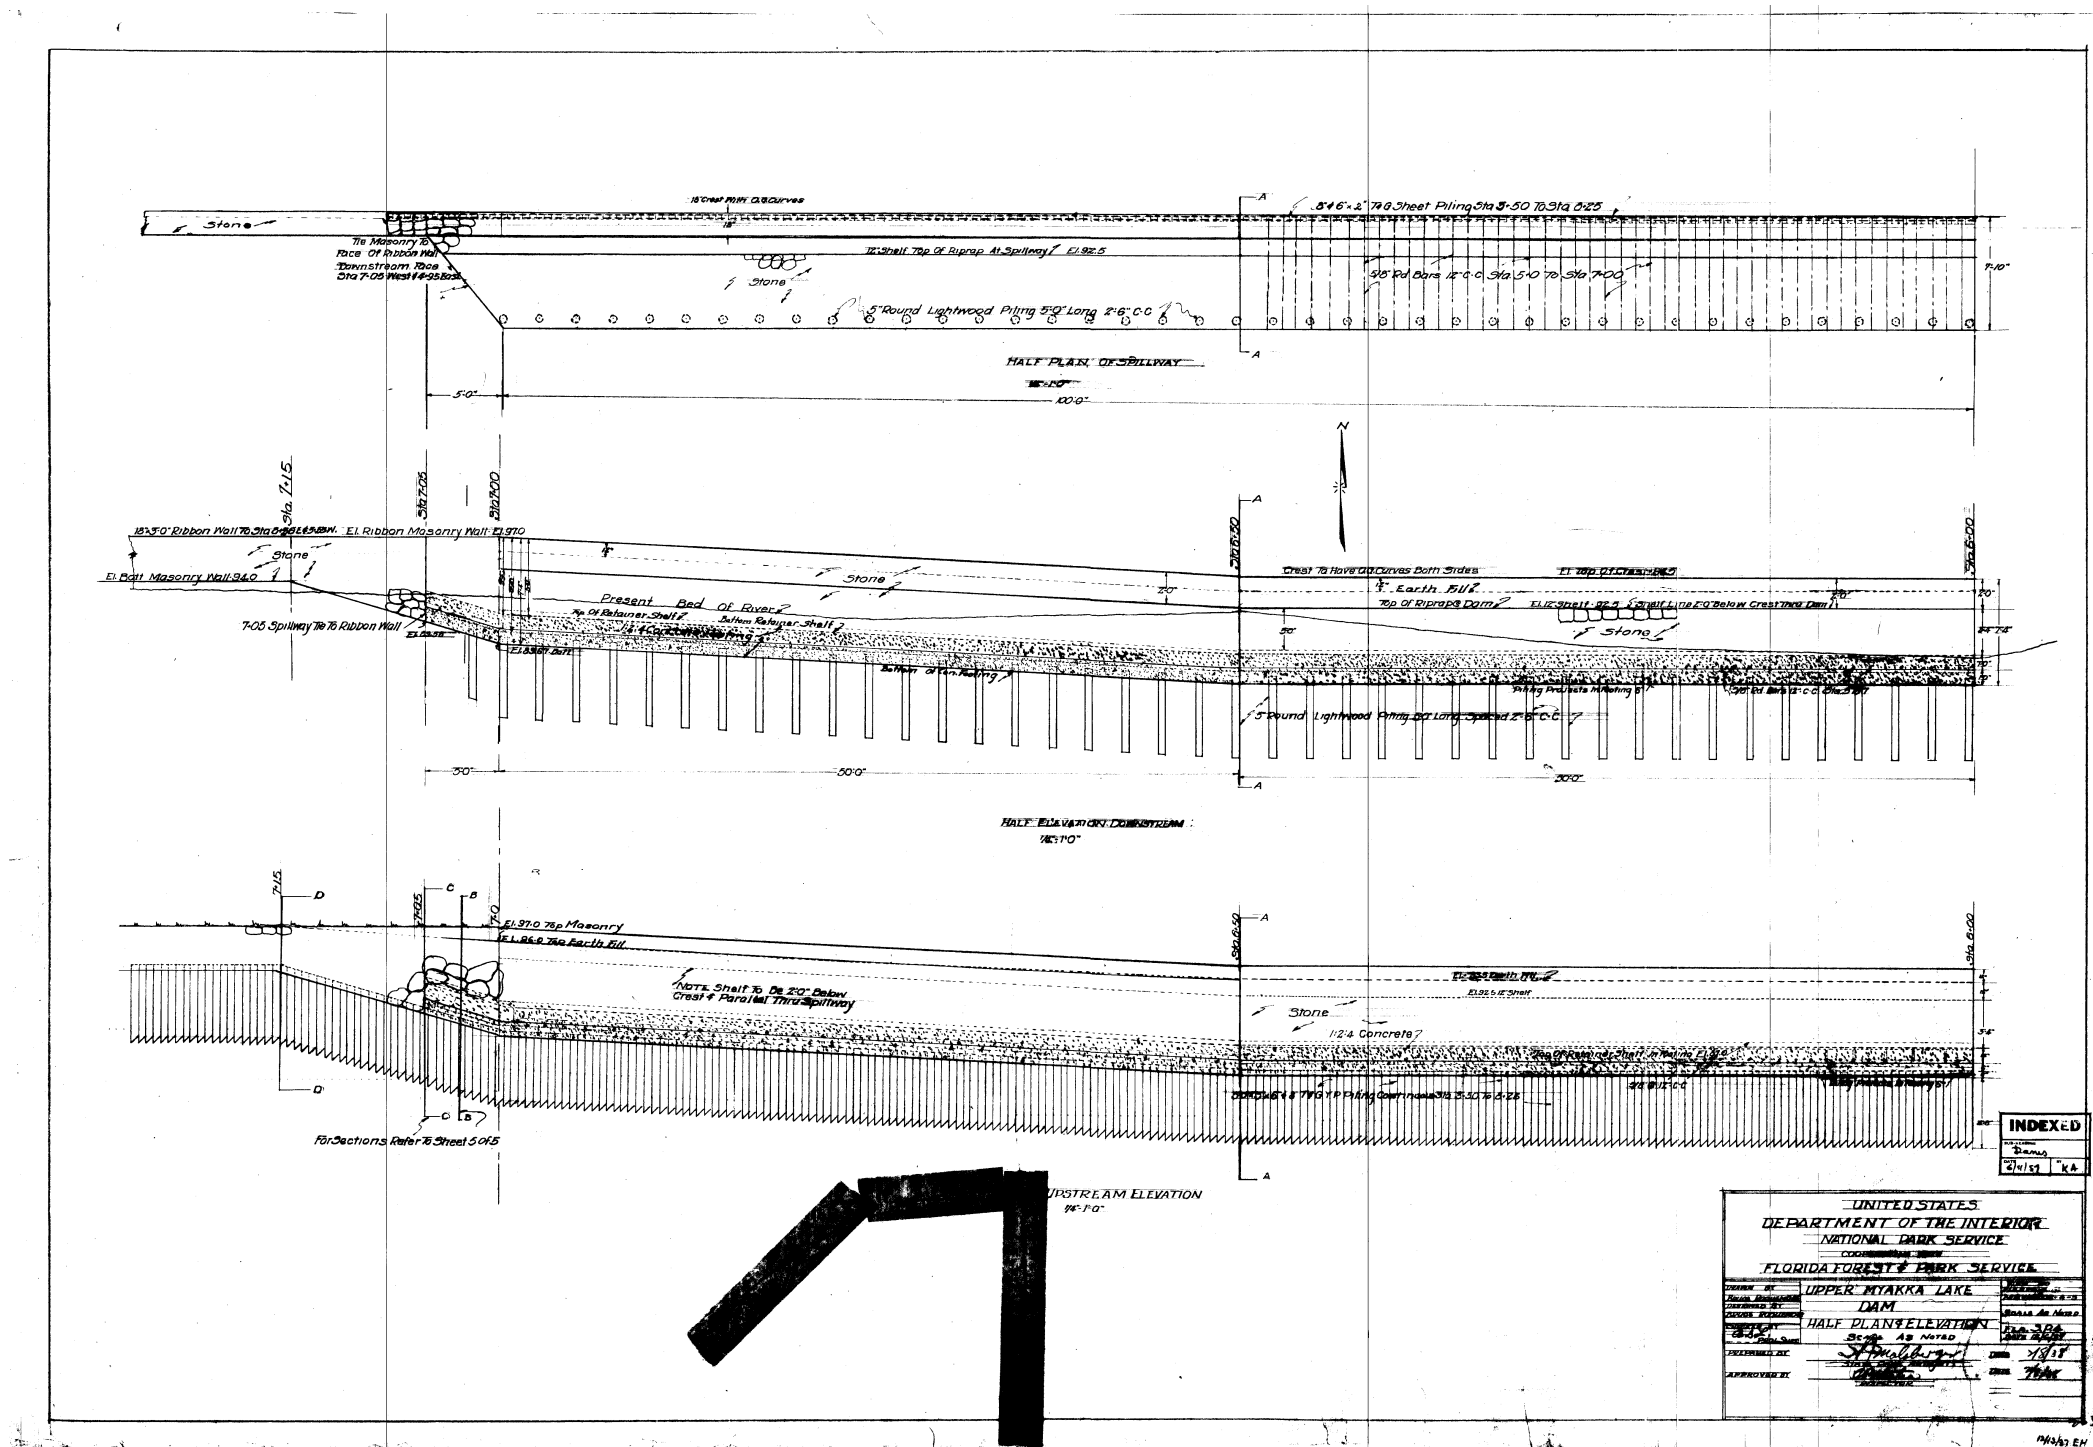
Detailed plans from 1937 original design of the Upper Myakka Dam (85O2273) on the Upper Myakka Lake, showing half plan and elevation.
